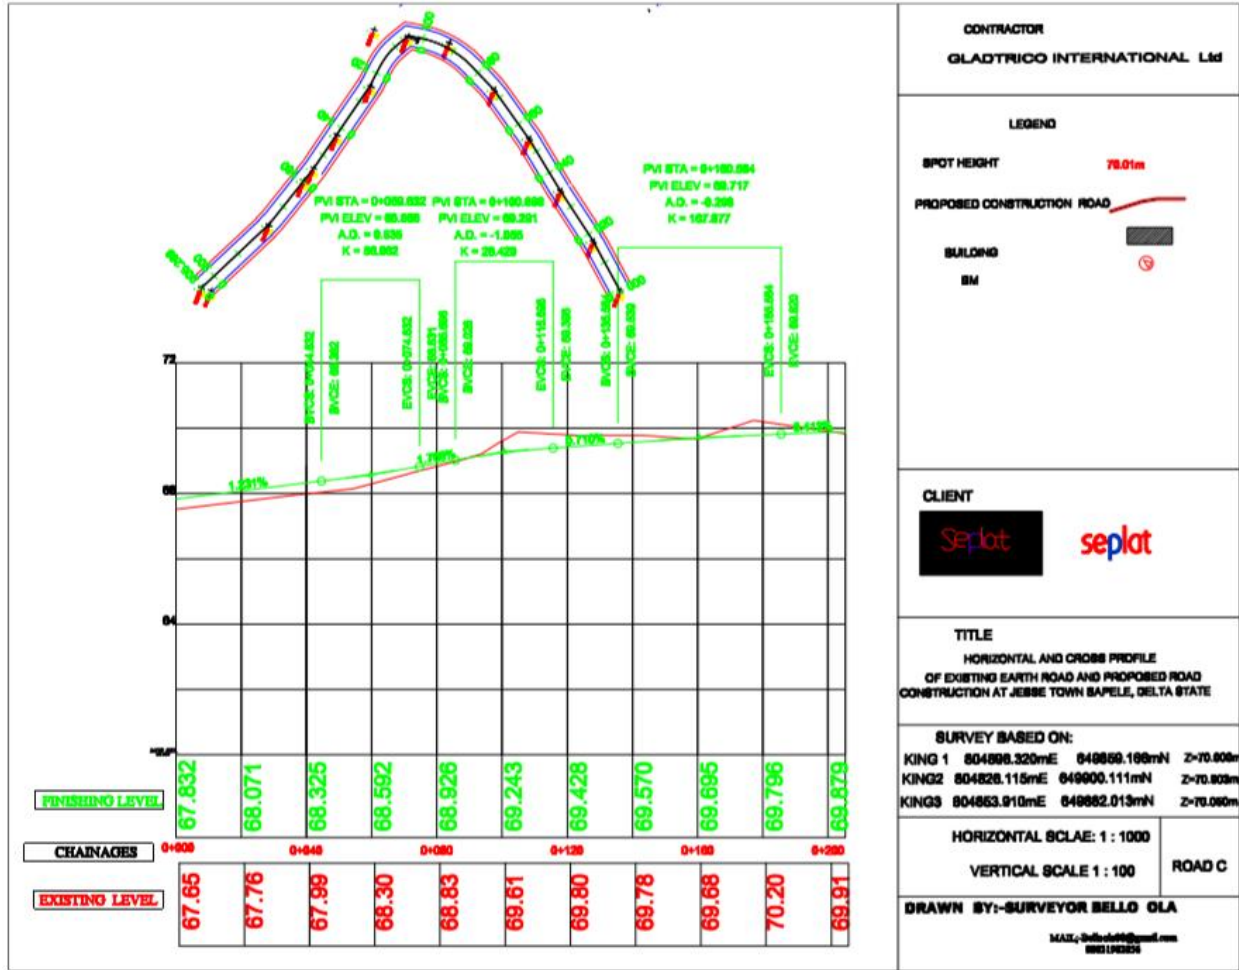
Horizontal and cross profile design of existing and proposed road at Jesse, Sapele, Delta State (road C).
